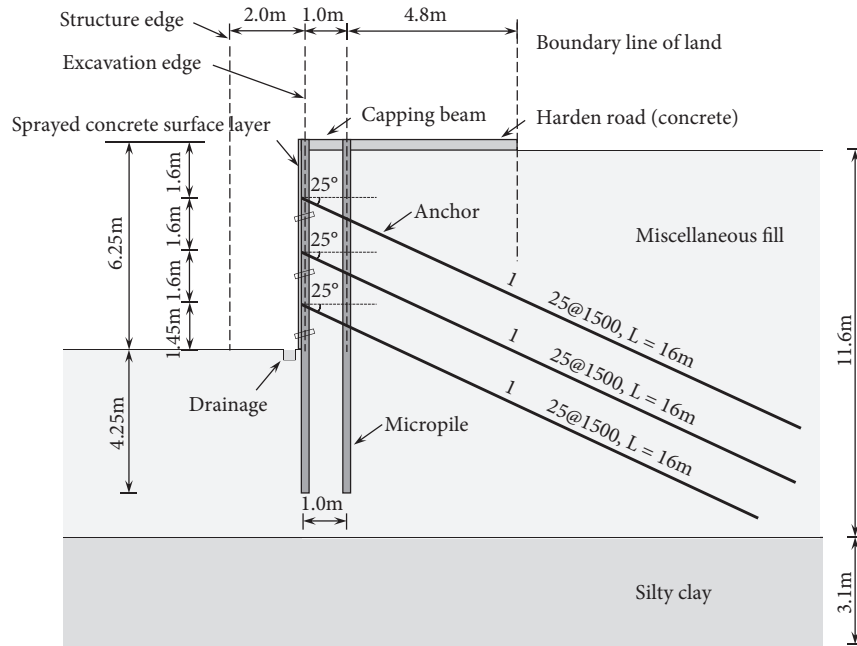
Typical section of double row steel pipe micropile composite retaining structure.
